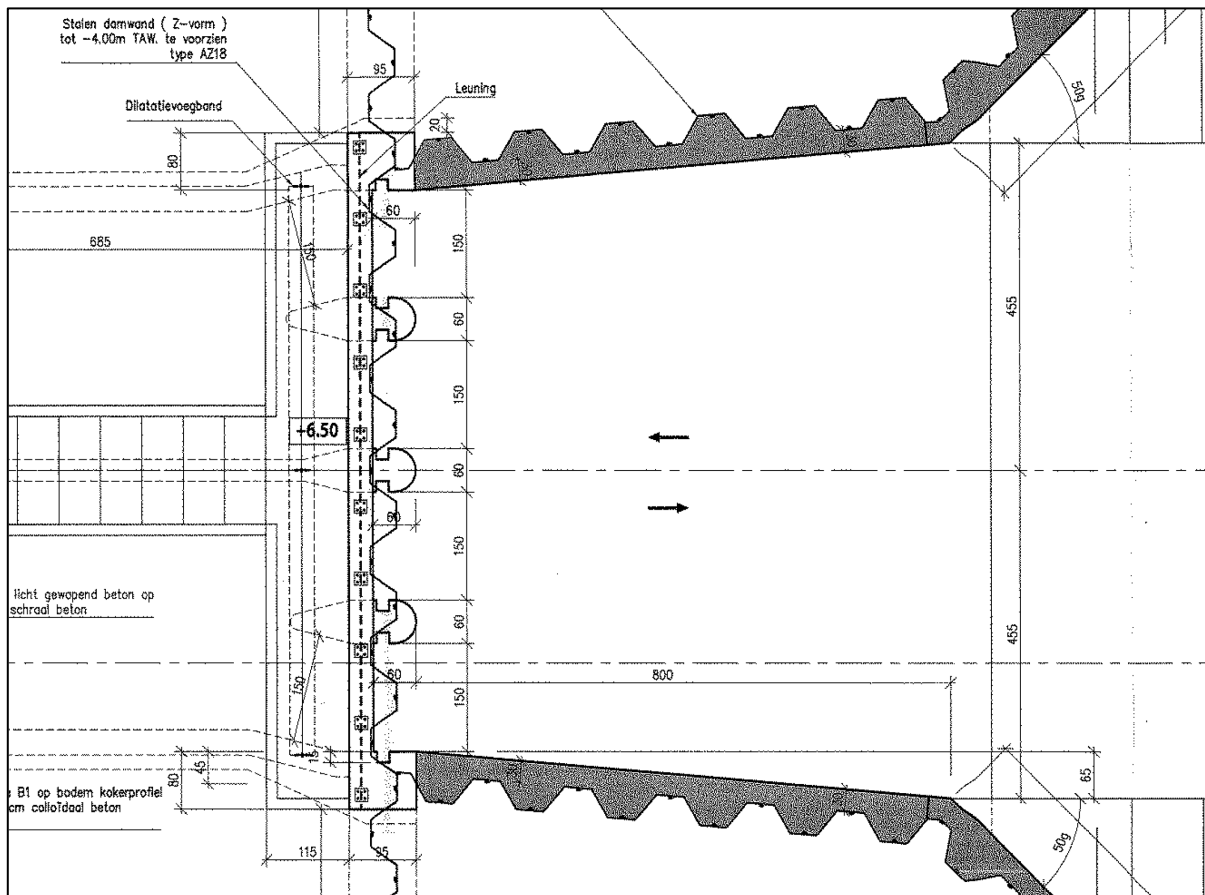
Cross section of culverts of Burchtse Weel (source: W&Z)
